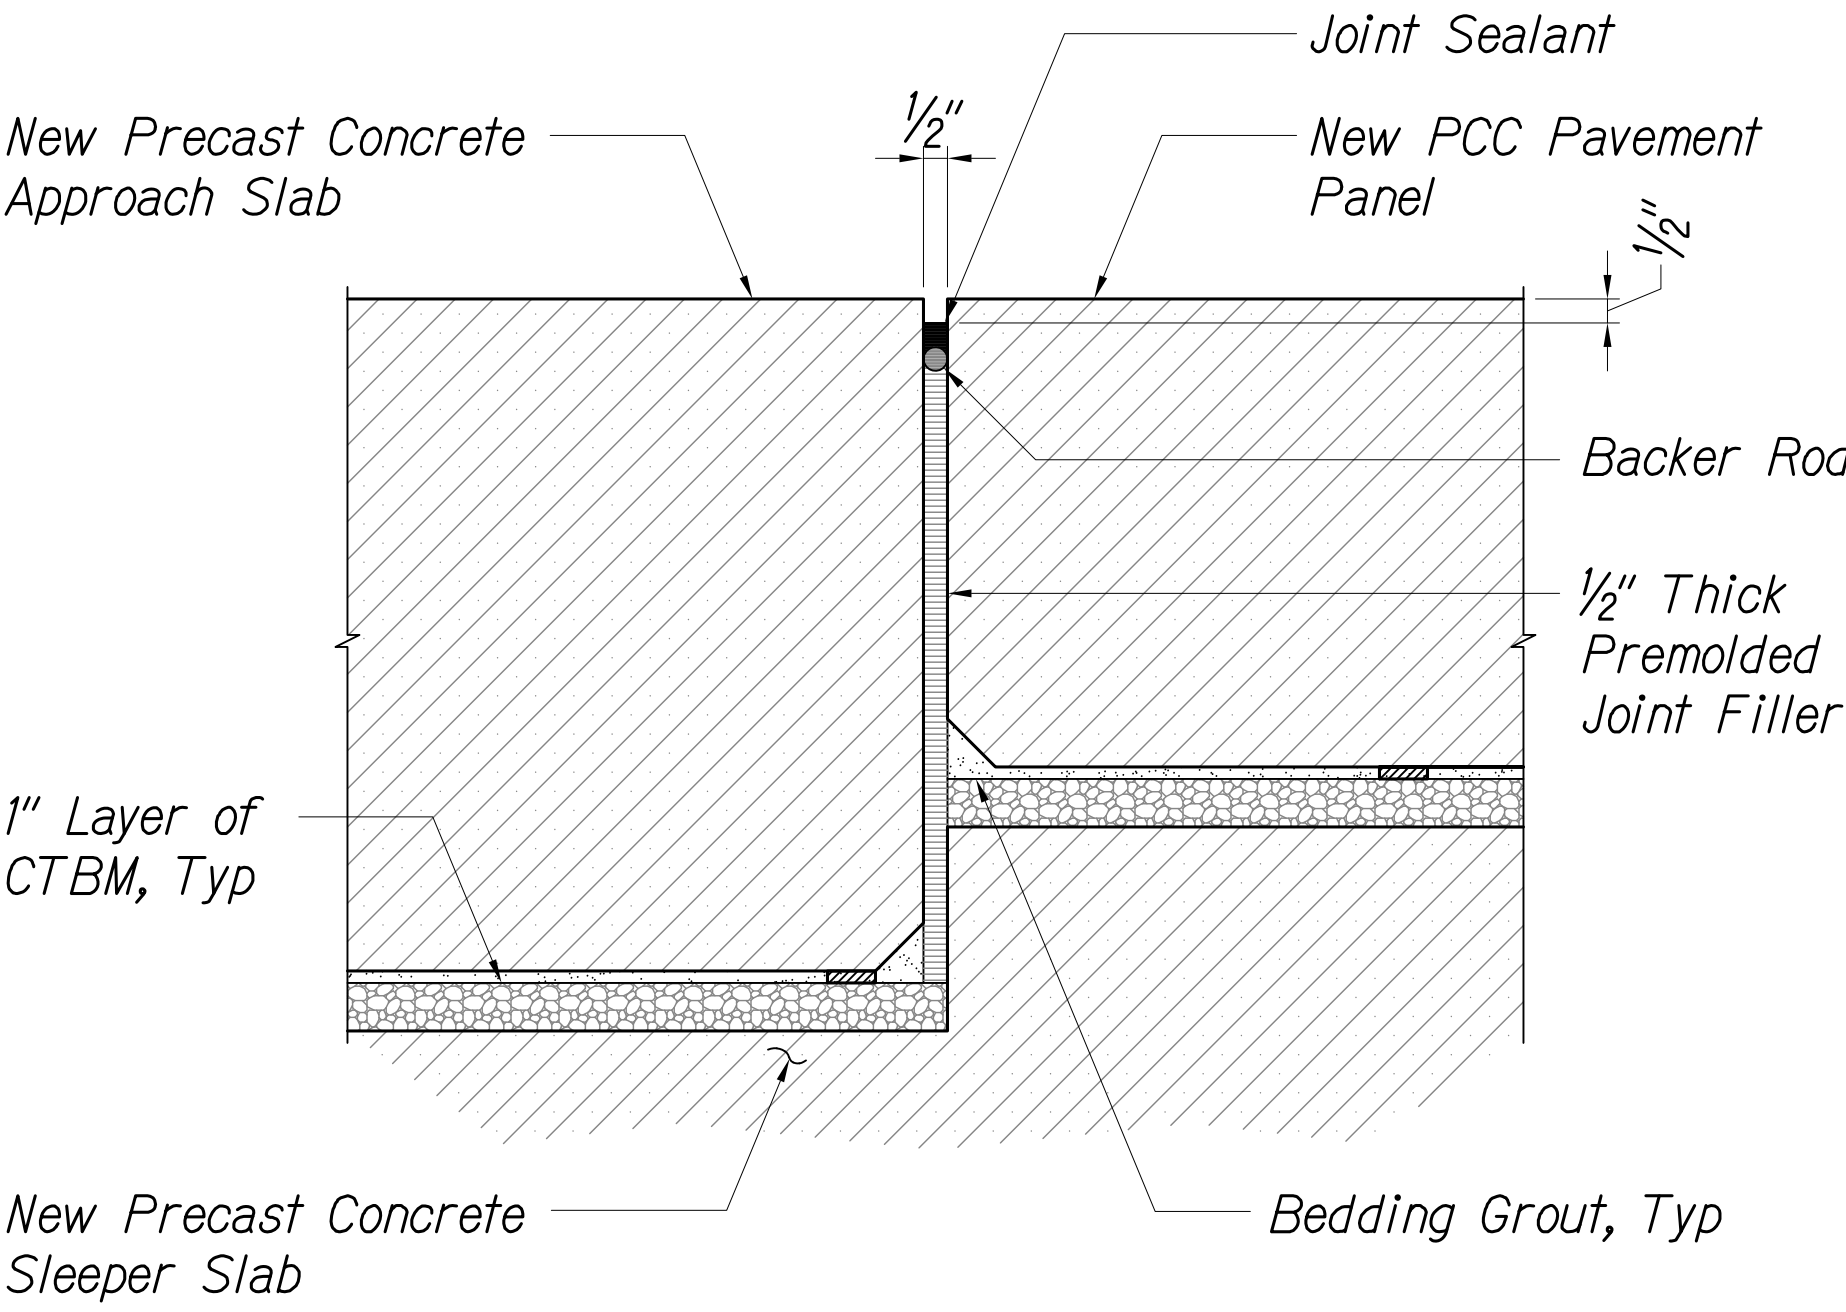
DETAIL (AT SLEEPER SLAB - PERPENDICULAR TO ABUTMENT)
